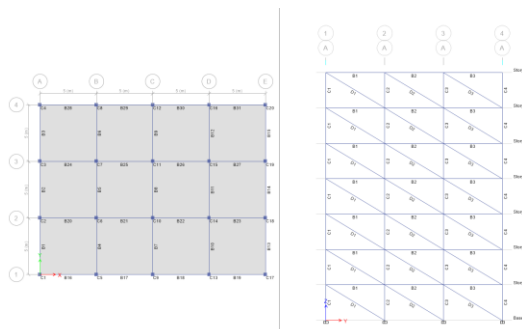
Etabs Model of G+5 Building Model having fully infilled walls
